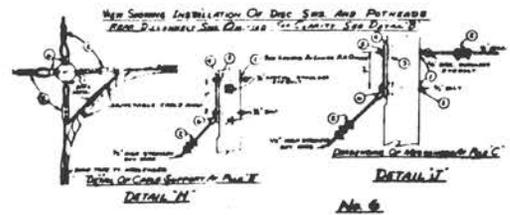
Section of a completed electrical photo-drawing for a revision to an existing facility.
